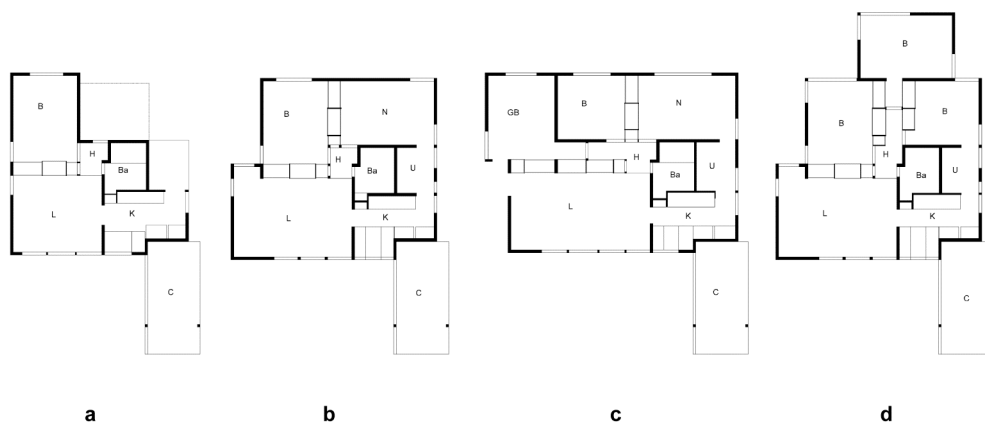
The Schindler Shelter schemes with the Panel Post Construction, dated in 15 August 1942. a. One bedroom house, 480 sq/ft. b. Standard two bedroom house, 730 sq/ft. c. Three bedroom House, 890 sq/ft. d. Three bedroom house, 904 sq/ft. Drawings are redrawn by the author.
